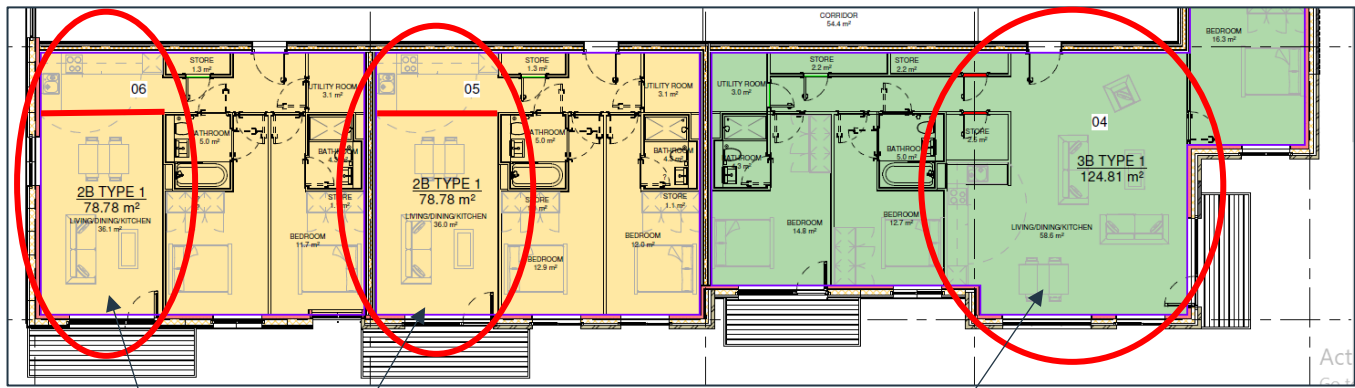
Example LKD layouts from Block D4 3rd Floor Architect Plans
